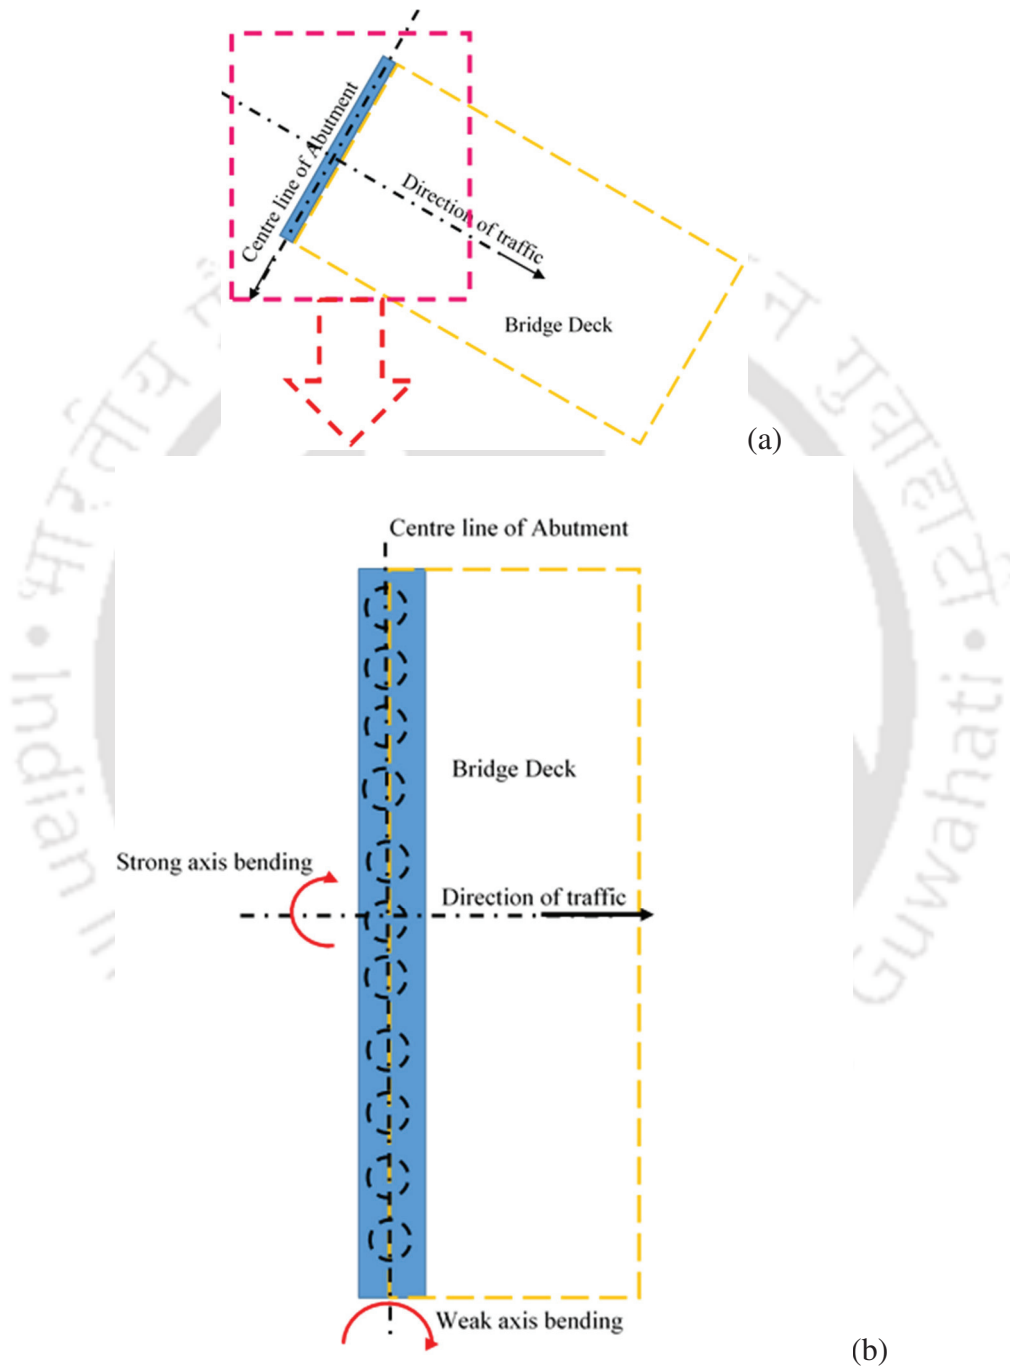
(a) Orientation of bridge deck and abutment in plan and (b) weak and strong axis bending of an integral abutment.
